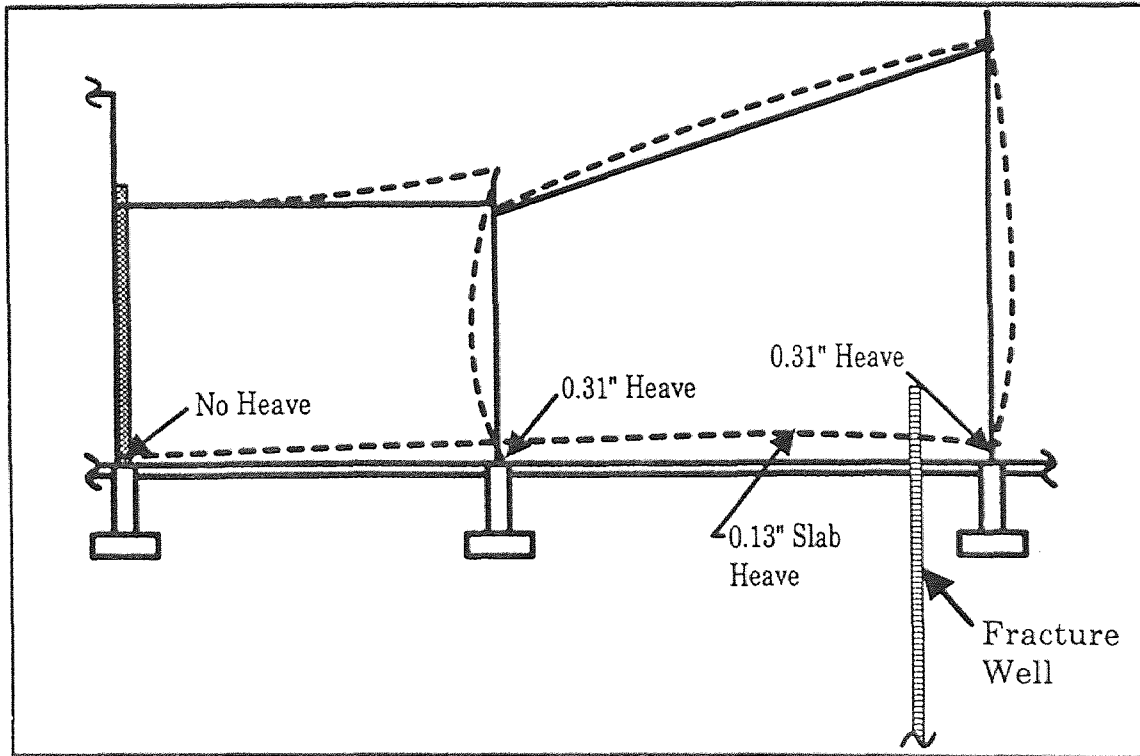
Exaggerated Deflected Structure Shape for Section A-A, Fracture No. 1.
